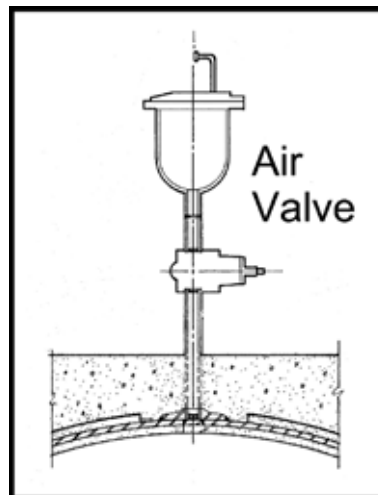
Elevation view of 1-inch air valve installation on pipeline
